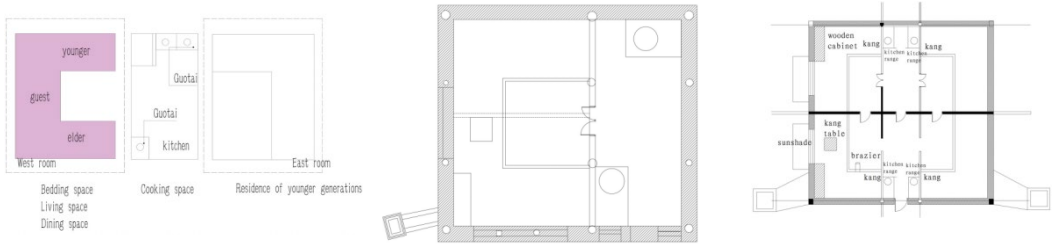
, 9, 10: Two-door plan (drawn by the author), Three-room plan, Five-room plan
